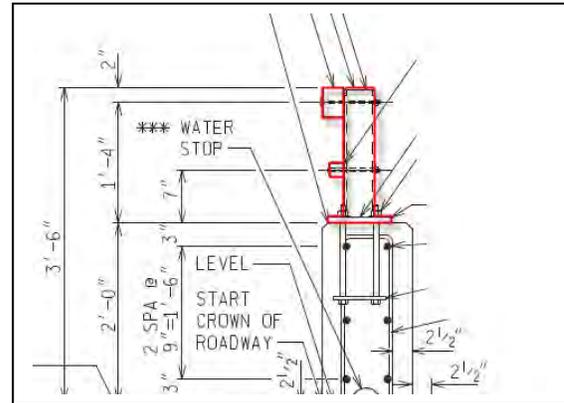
Aesthetic Parapet Steel Perimeter
